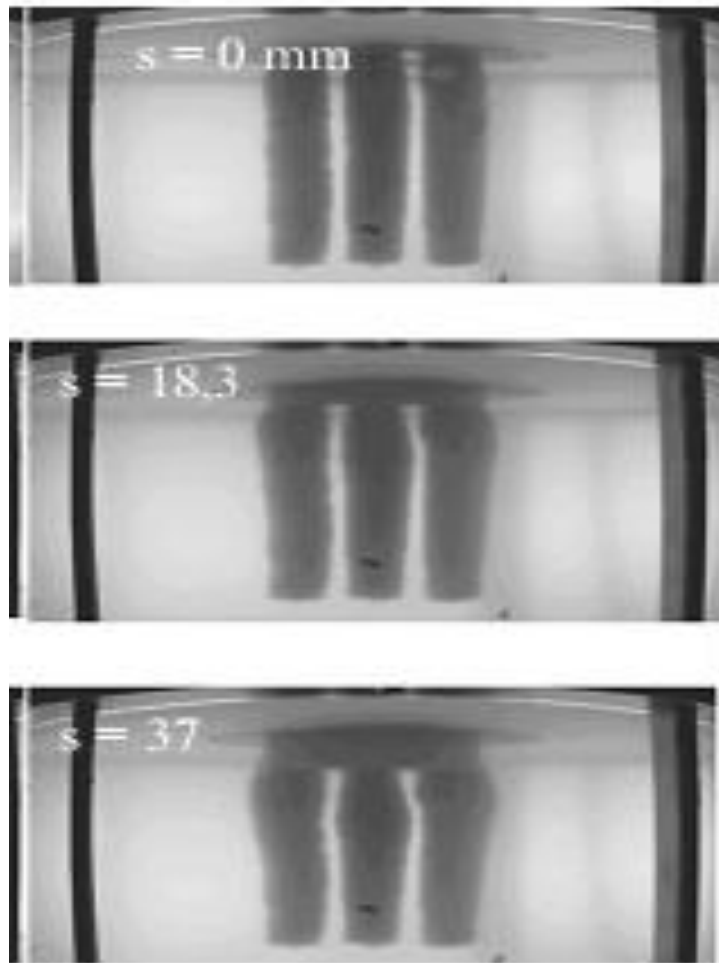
Bulging failure in sand columns in different steps of loading (Mckelvey et al, 2004)
